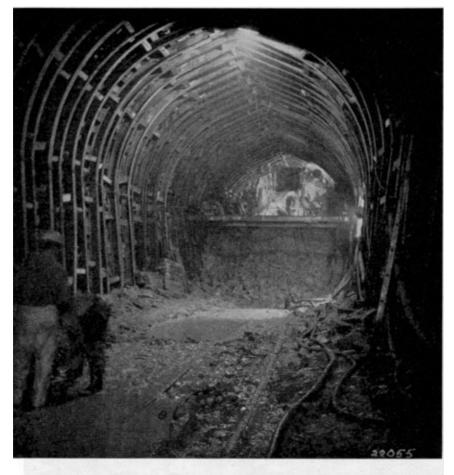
General view of tunnelling in the faulted zone showing the drifts being driven from a false deck
